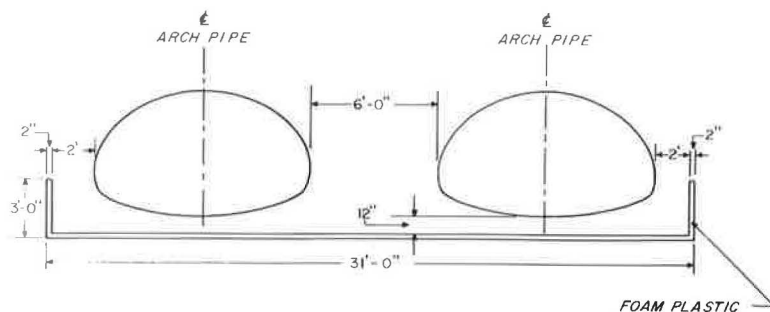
End elevation of arch pipe culvert and foam plastic insulation.
